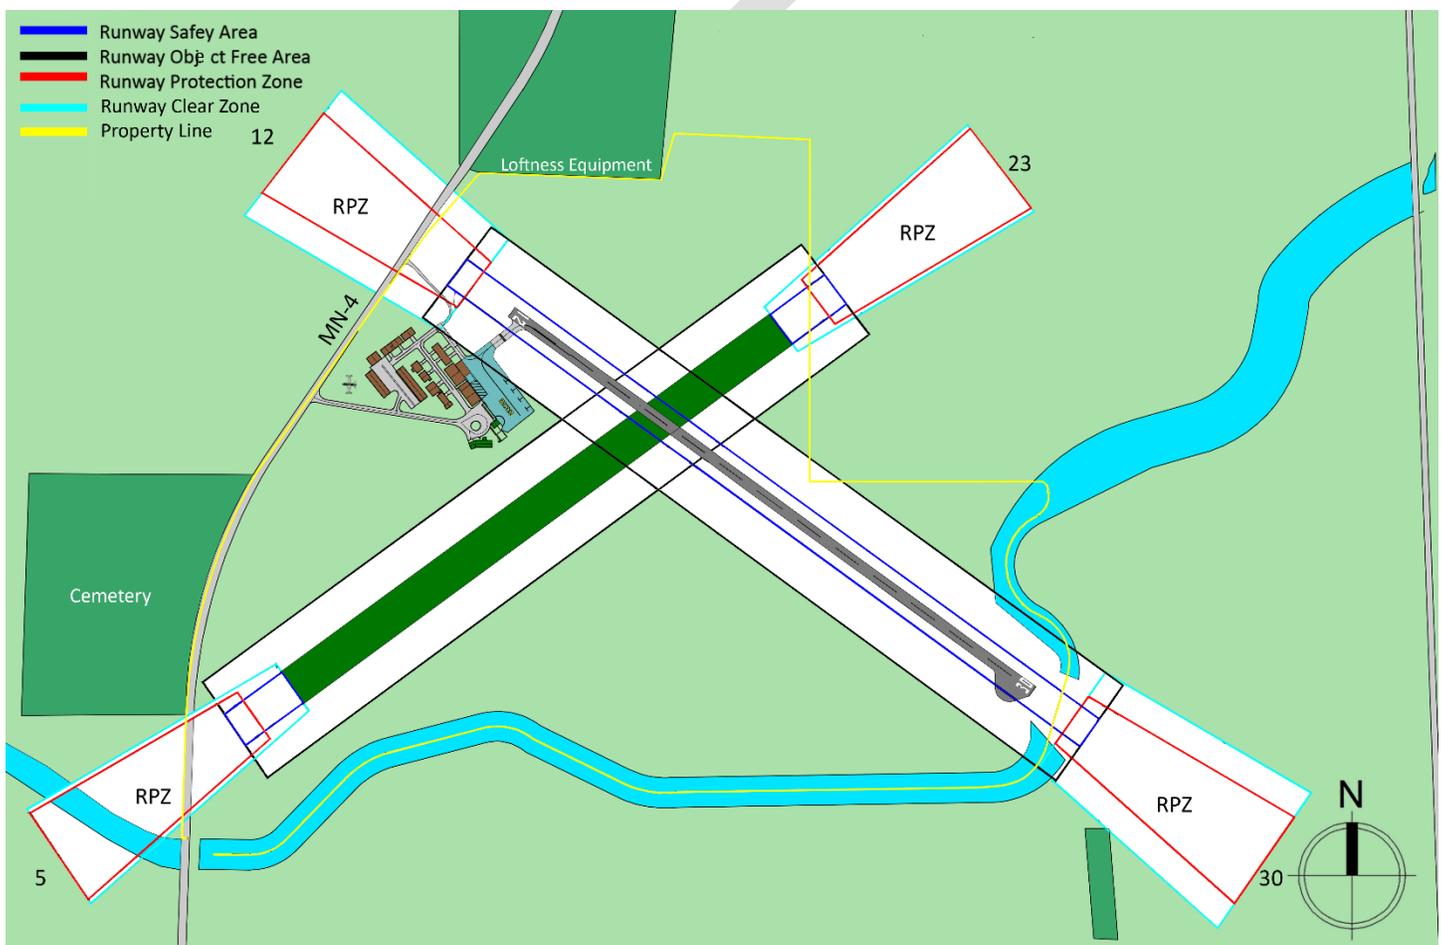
Existing Runway Protection Zones and Clear Zones
